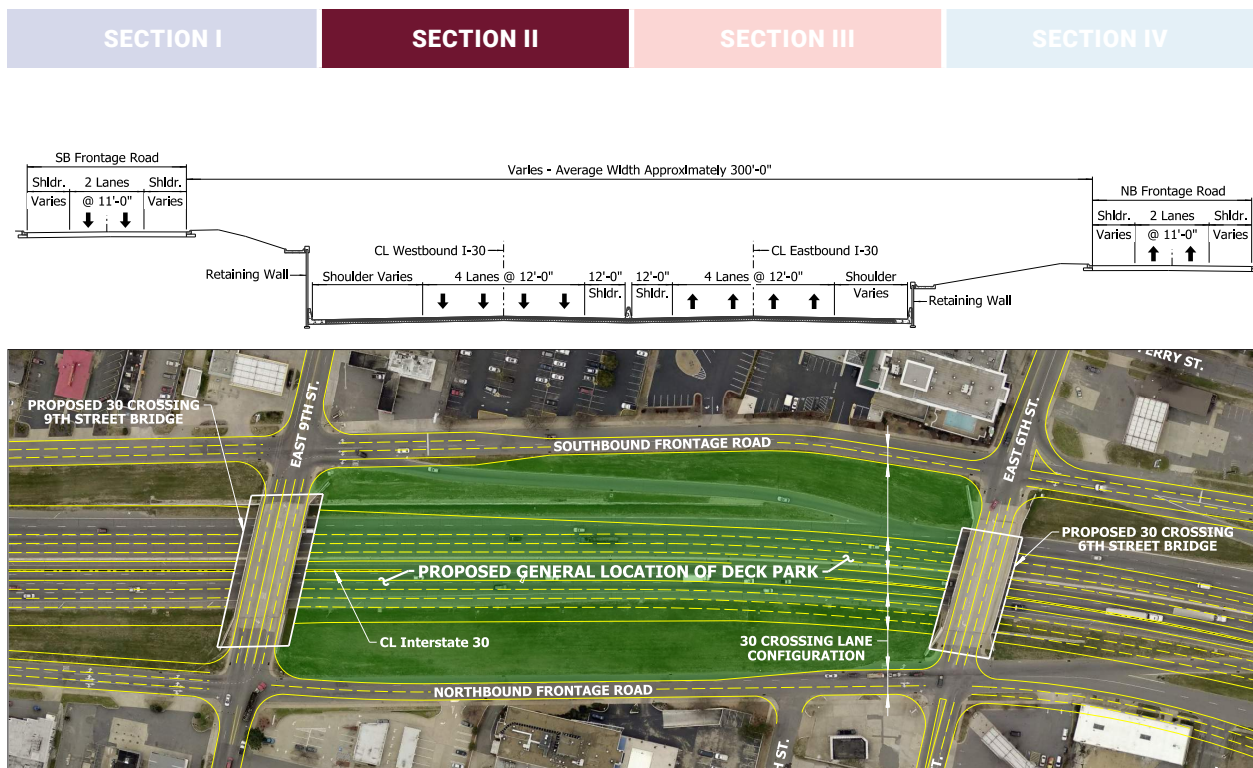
30 Crossing I-30 Plan View and Typical Section
